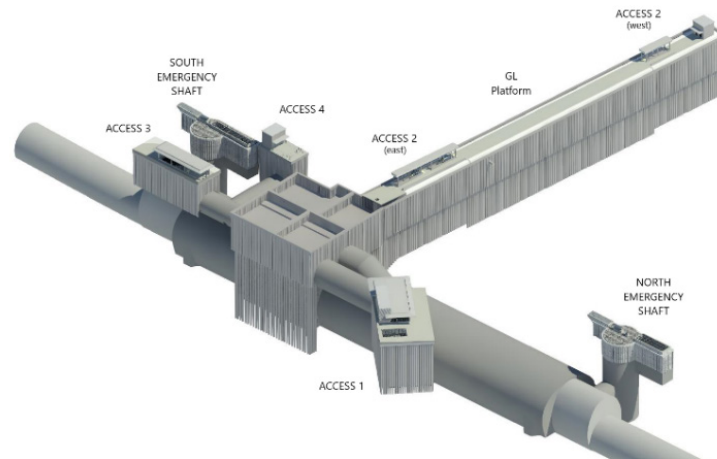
Layout of Bar Ilan Station (Cavern, “Big Box” and Accesses).
